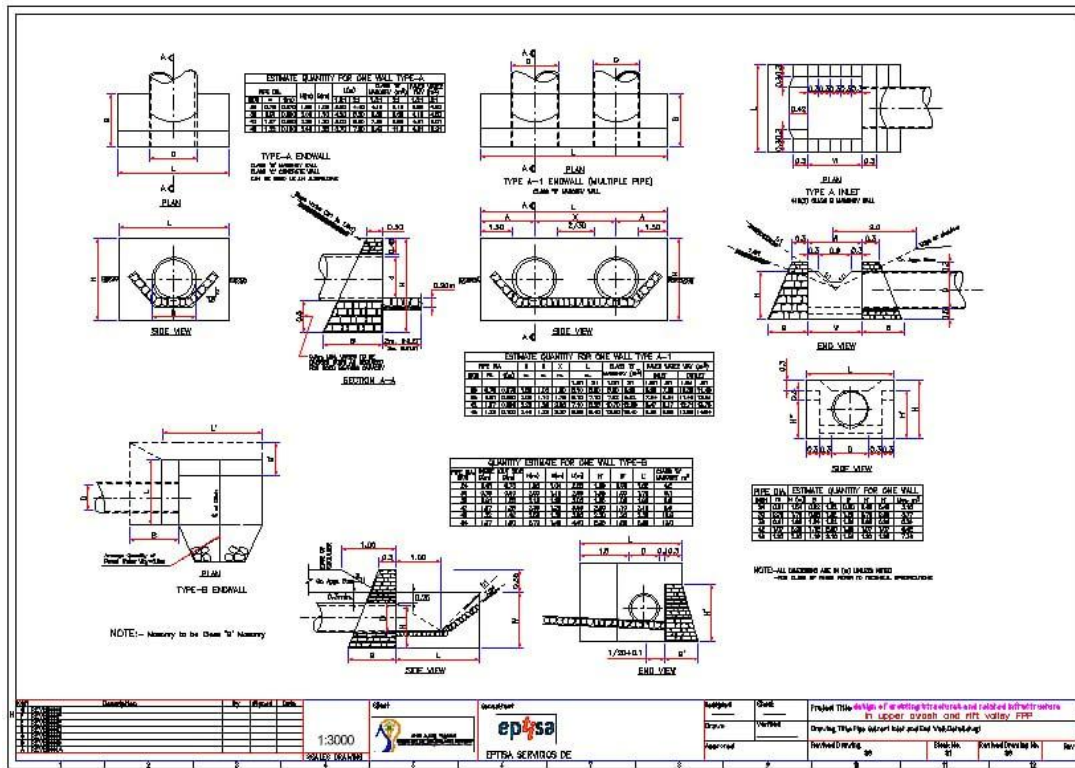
Section View and plan of Pipe Culver structures at Assas River
